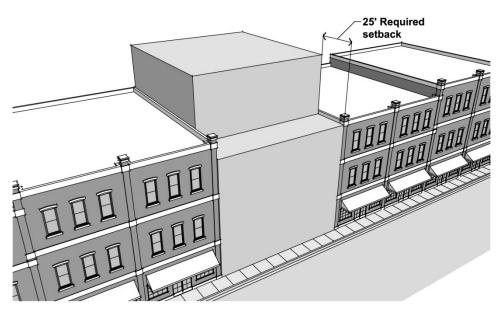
UPPER-FLOOR BUILDING SETBACK
